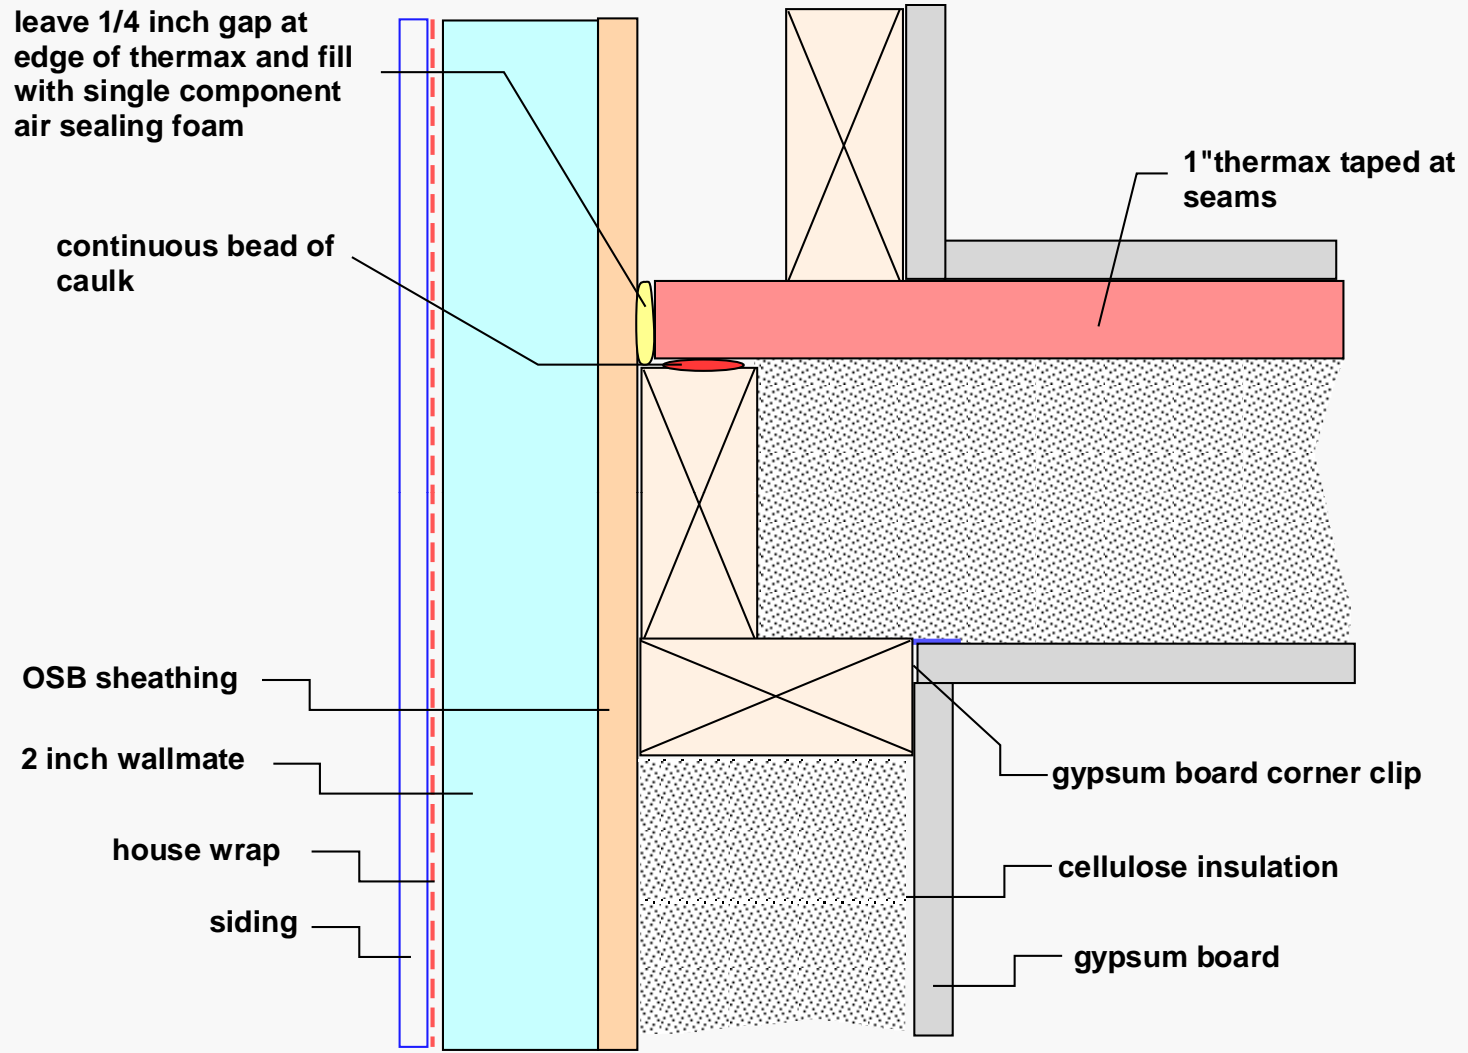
Plan section of intersection of exterior garage wall, exterior stairwell wall and garage/stairwell wall.
